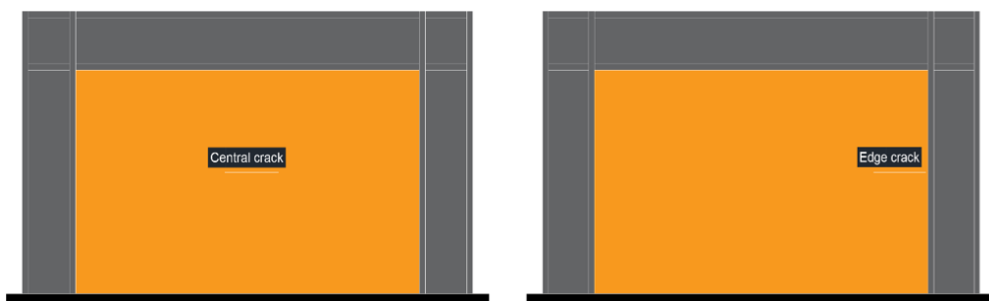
Schematic view of the location of the cracked plate shear walls
